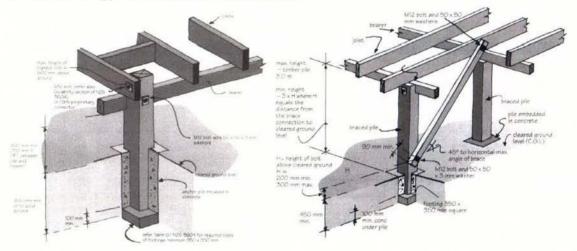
Anchor Pile Solution (Source: BRANZ 2000) Figure 5-2 Braced Pile Solution, Braced from Pile to Joist (Source: BRANZ 2000)
